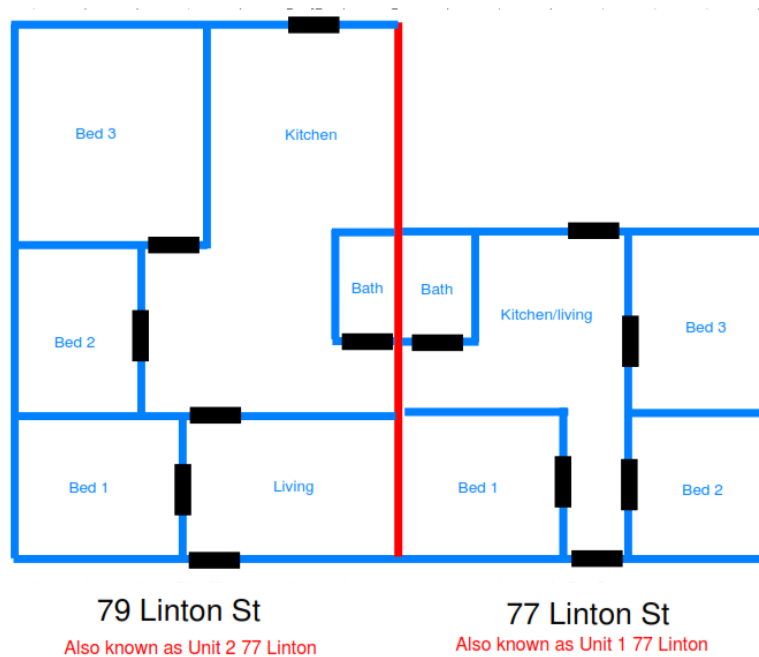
Floor Layout of Dual Occupancy on 77 Linton Street
